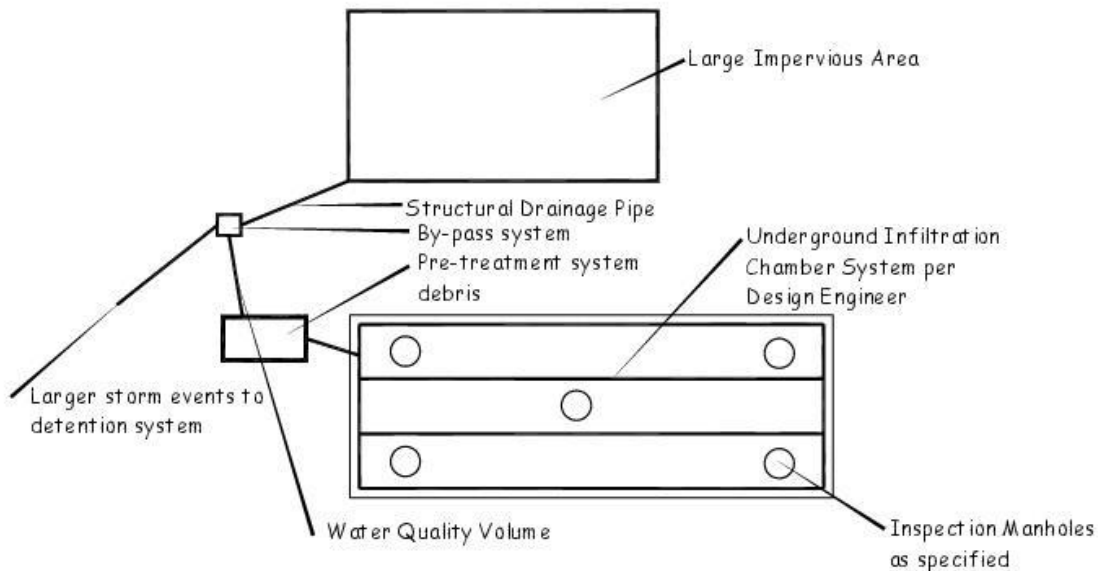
Typical Underground Chamber - (Trinka Engineering, LLC - 2017)
